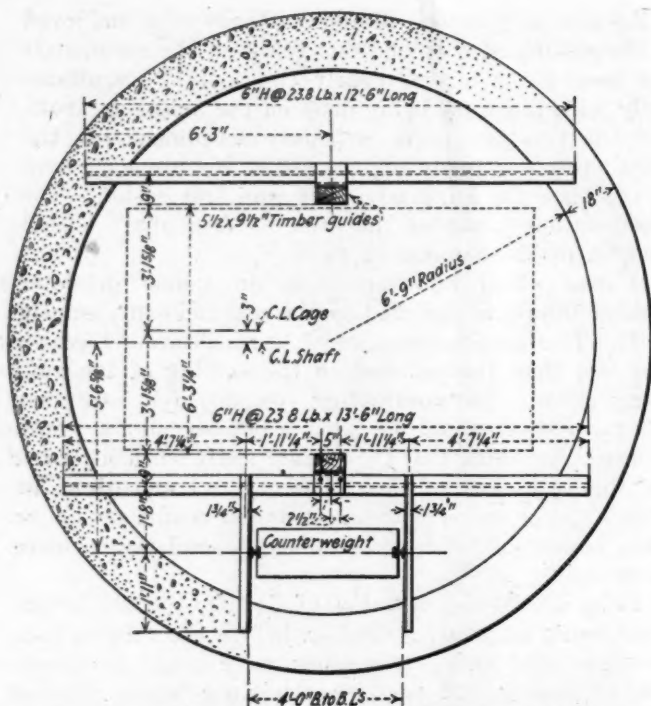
CROSS-SECTIONAL PLAN OF AUXILIARY SHAFT
